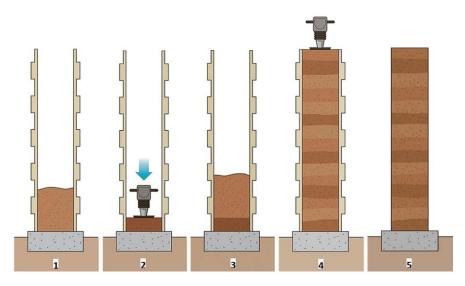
Contemporary rammed earth technique [13]. 1- Wooden temporary forms are placed on poured concrete foundations; 2- A damp moist blend of sand, gravel, silt, clay and cement is poured in layers (15-25 cm thick) into the wooden forms; 3- A pneumatic backfill tamper compacts firmly each layer until it becomes very solid and hard; 4-Compiled layers are firmly compacted one on top of another to reach the top of wooden forms or the wall. To increase energy efficiency, heat insulation can be integrated. Moreover, in the areas of high seismicity, reinforced steel is also incorporated; 5- The wooden forms can be finally removed once the top layer is strongly compacted.
